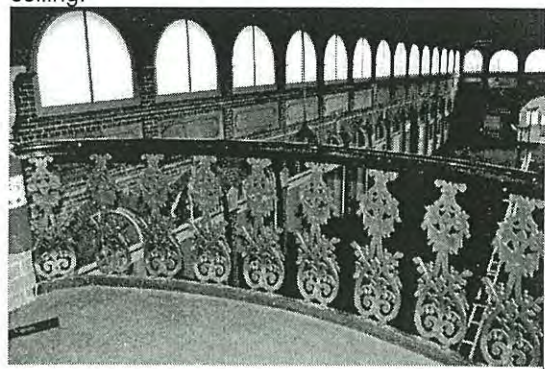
Interior, Landing & Stairs (space FF12). Detail of original curved landing with reconstructed sway bellied cast iron balustrade.
